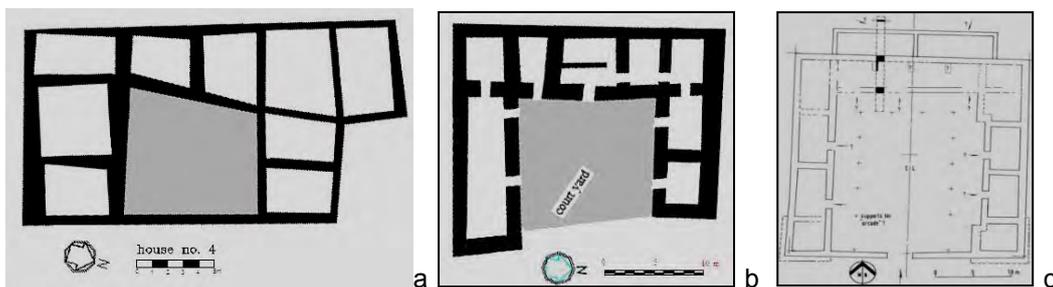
(a) plan of house no. (4) at al-Hallabat, (b) plan of house no. (19) at al-Hallabat, (c) plan of structure C at ar-Risha (Source: Helms, 1990: 85, Fig. 31).
